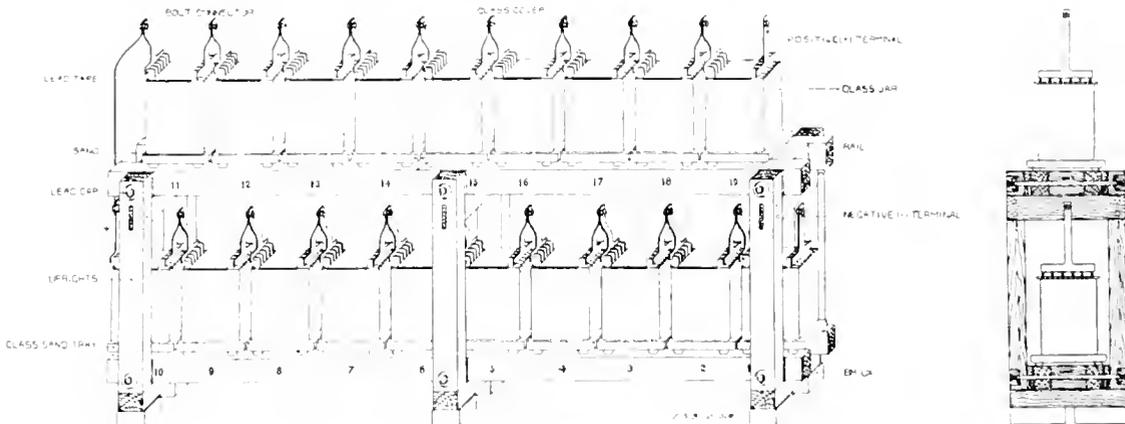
Typical Installation of Storage Battery on Wood Rack
